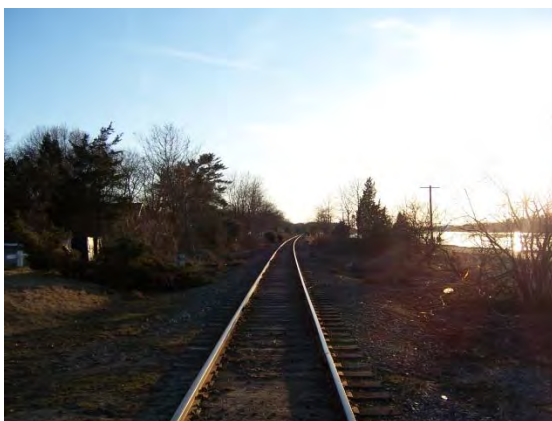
RAIL TRACKS WEST OF THE SAGAMORE BRIDGE
